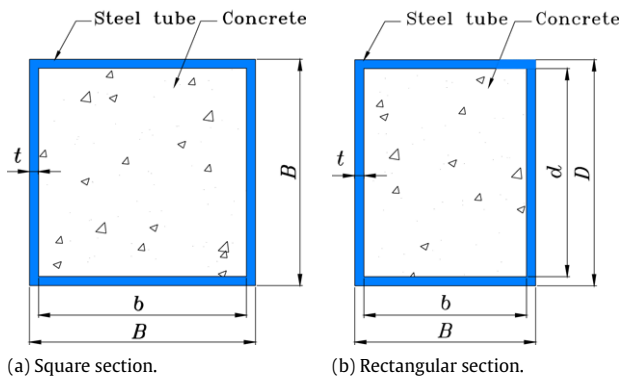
Thin-walled concrete-filled steel tubular beam-columns.
